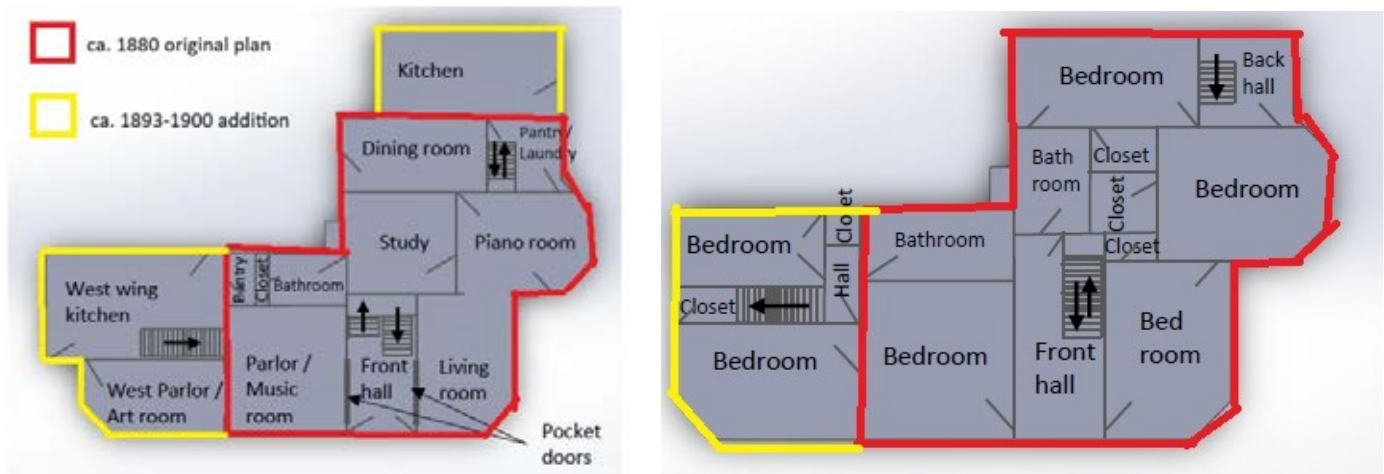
Current Floor Plan of the house, indicating the original house and later addition
